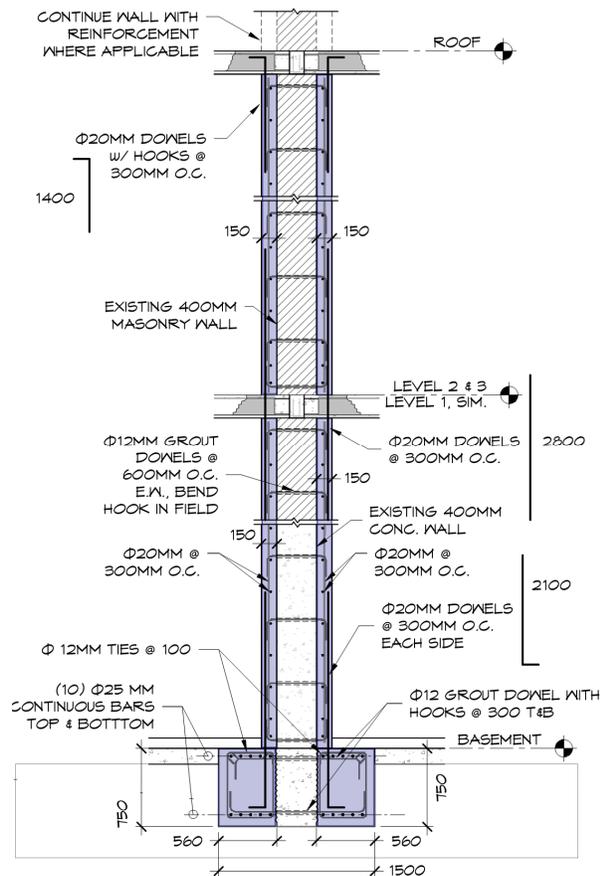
New grade beams shown in section. The lower transverse walls have been strengthened.
